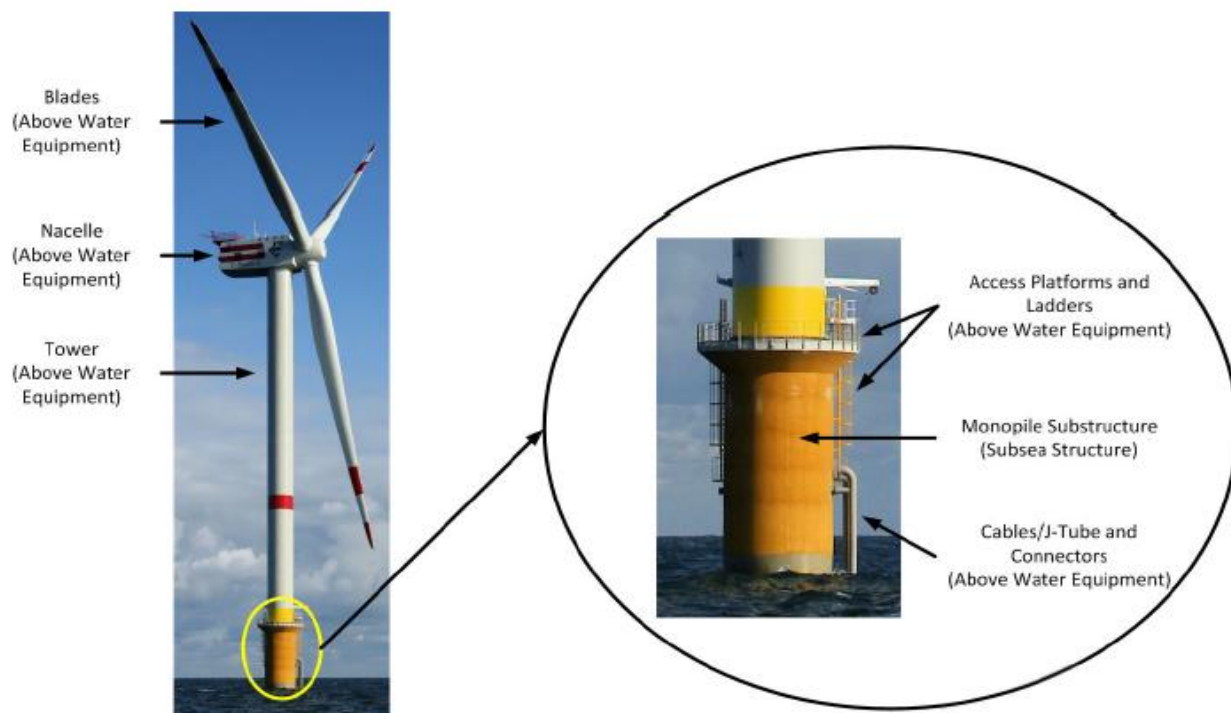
Typical offshore facility from the tower structure to blades (Sheppard et al., 2010)
